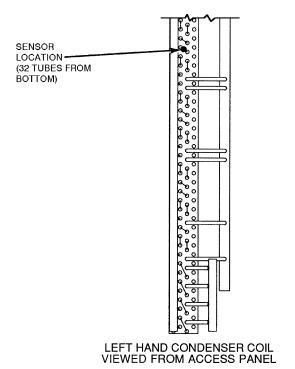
B — Motormaster® III Sensor Location (48AJ,AK,AW,AY035 and 48EJ,EK,EW,EY038, 044)
